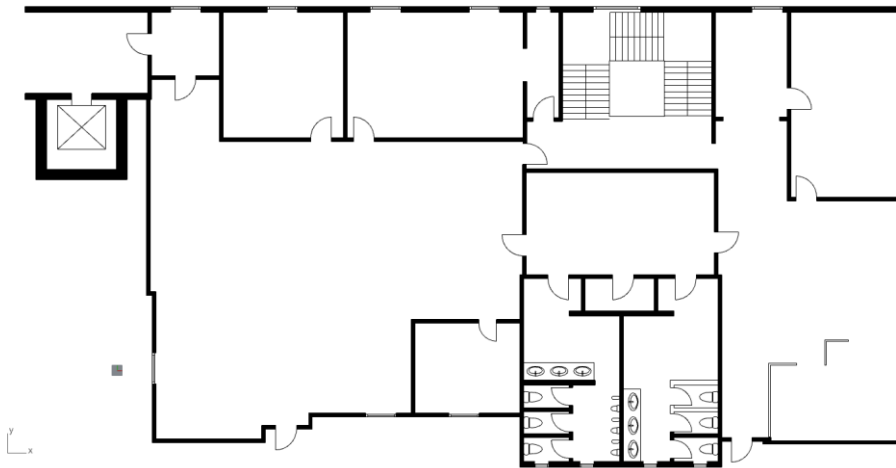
Static Floor Plan Geometry converted into Rhino line work
